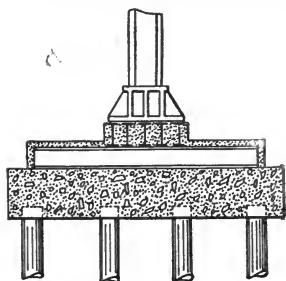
Pile Foundation in Fisher Building, Chicago.
